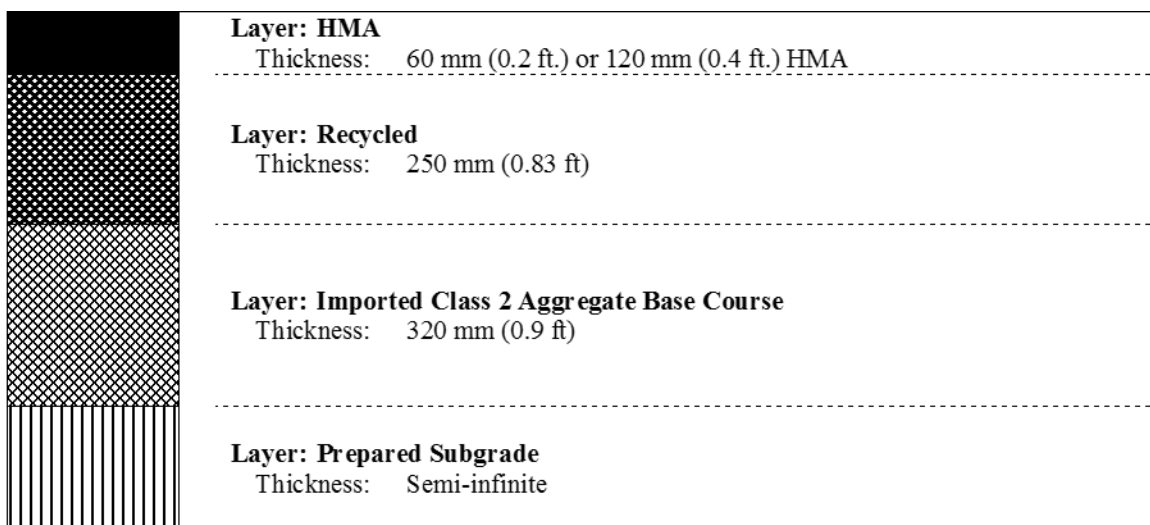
Illustration. Pavement structure for FDR and wide-base tire study test sections.
